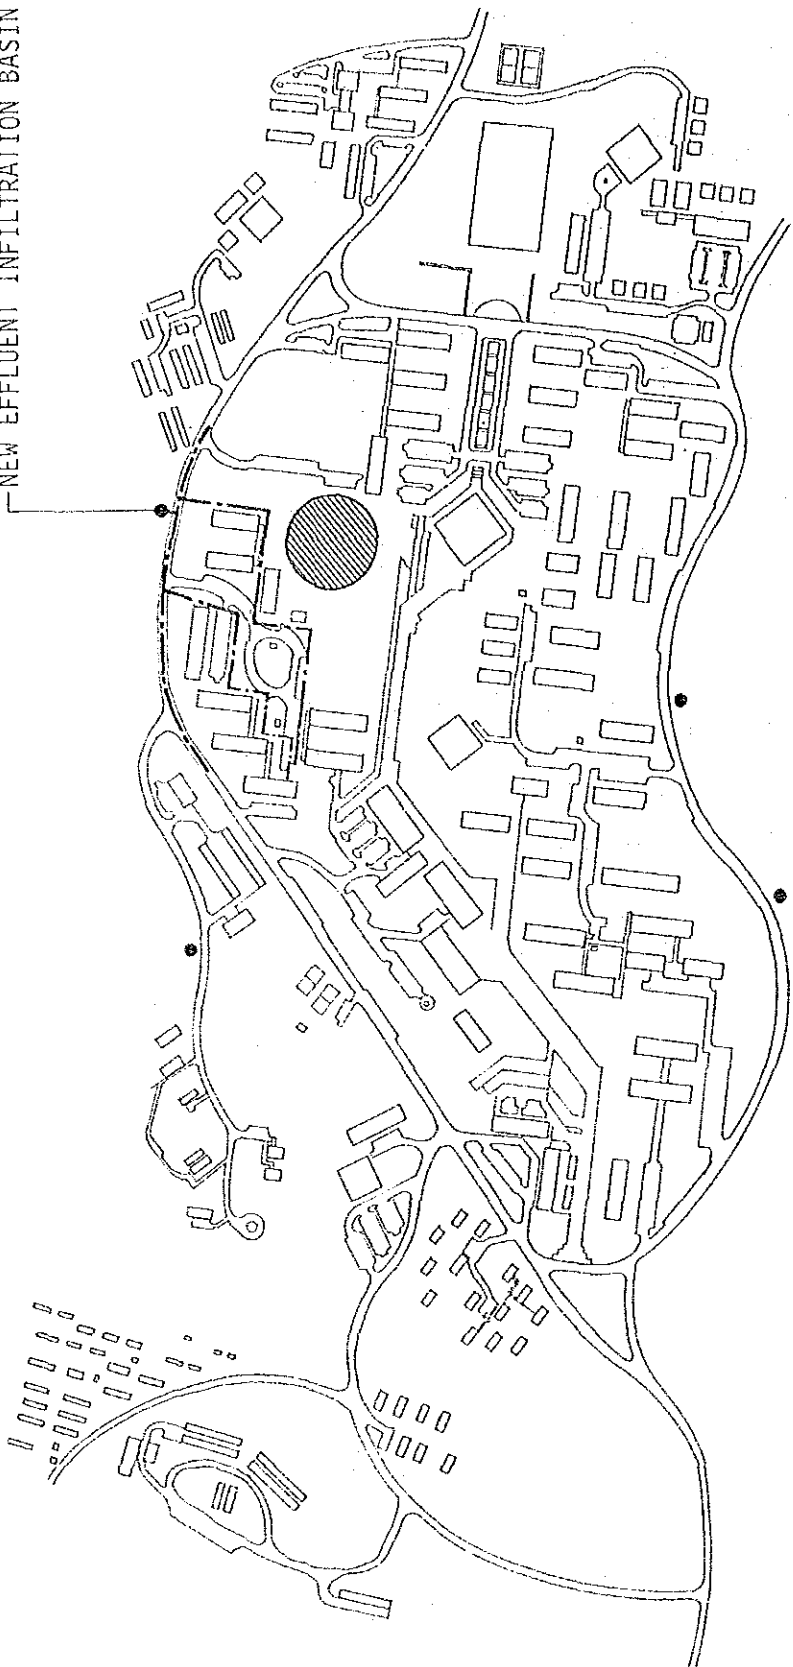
Waste Water Drainage Plan by Master Plan
